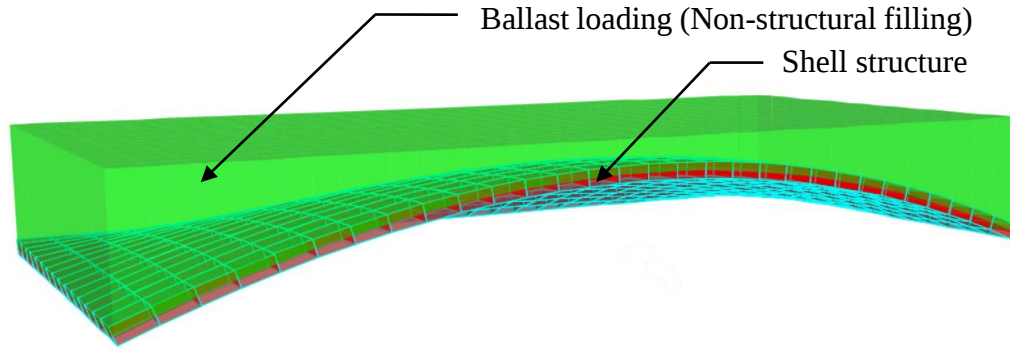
Cross section of the proposed slab system illustrating shell and ballast loading
